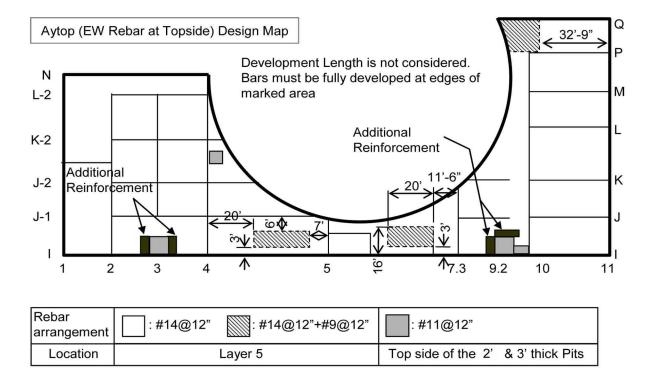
(Sheet 4 of 7) Longitudinal Reinforcement Map, Top Side in EW Direction
